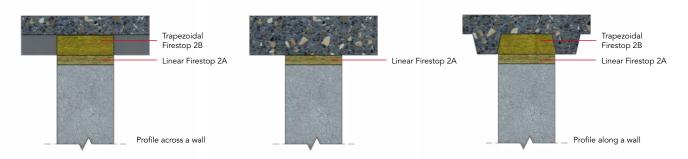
With / without profiled metal deck under a lightweight concrete slab
